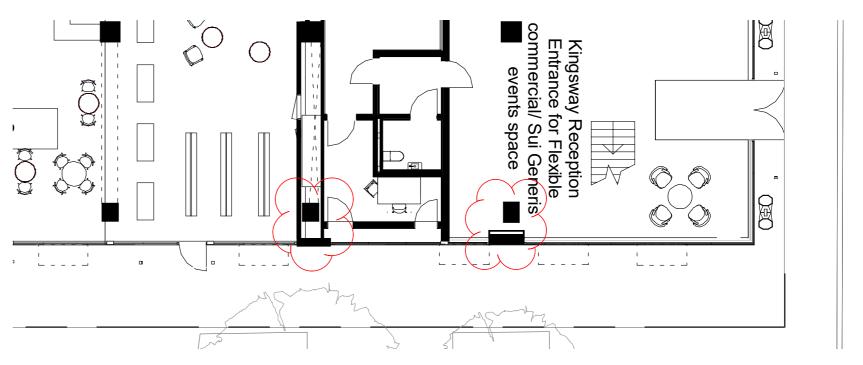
Consented Ground Floor Plan - Existing Concrete Piers Location
